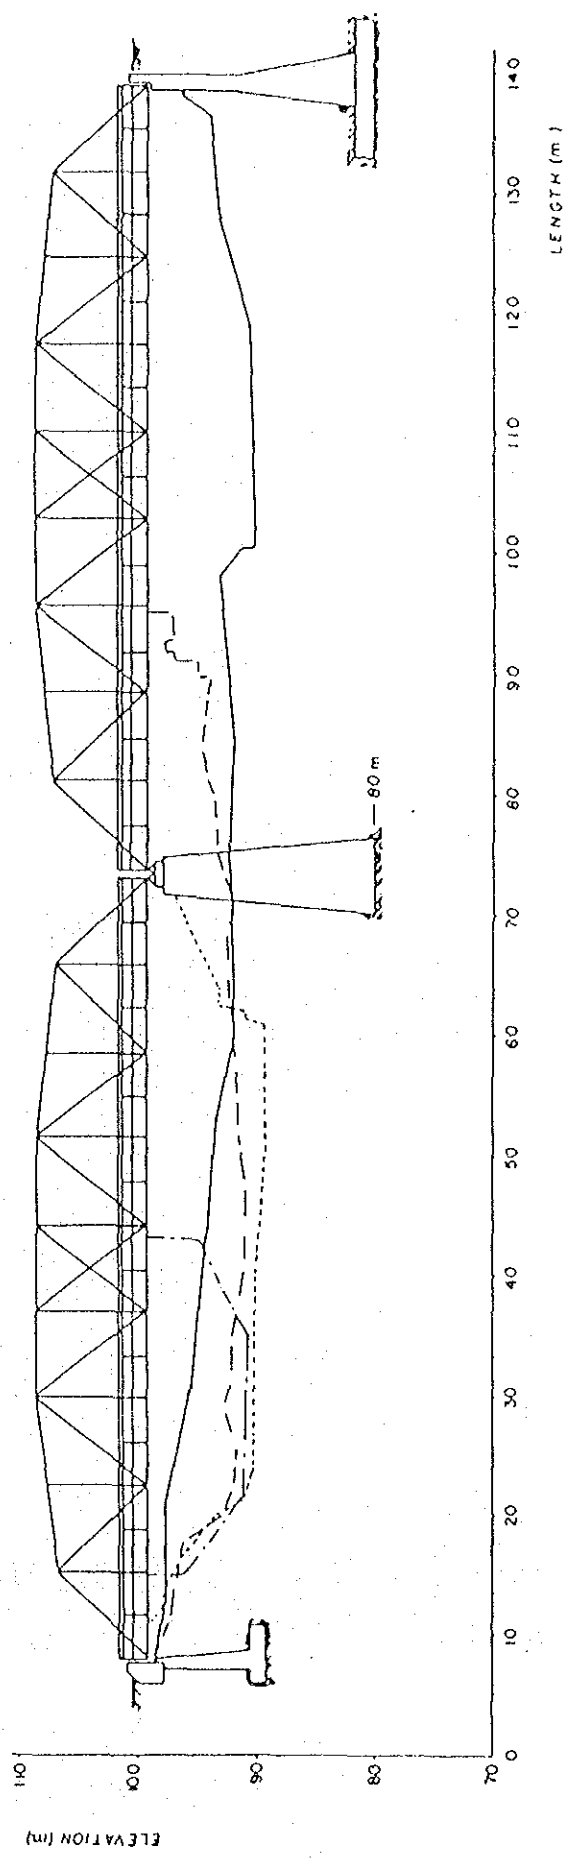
TRANSITION OF CROSS-SECTION AT ROAD BRIDGE IN PANTALEON RIVER
